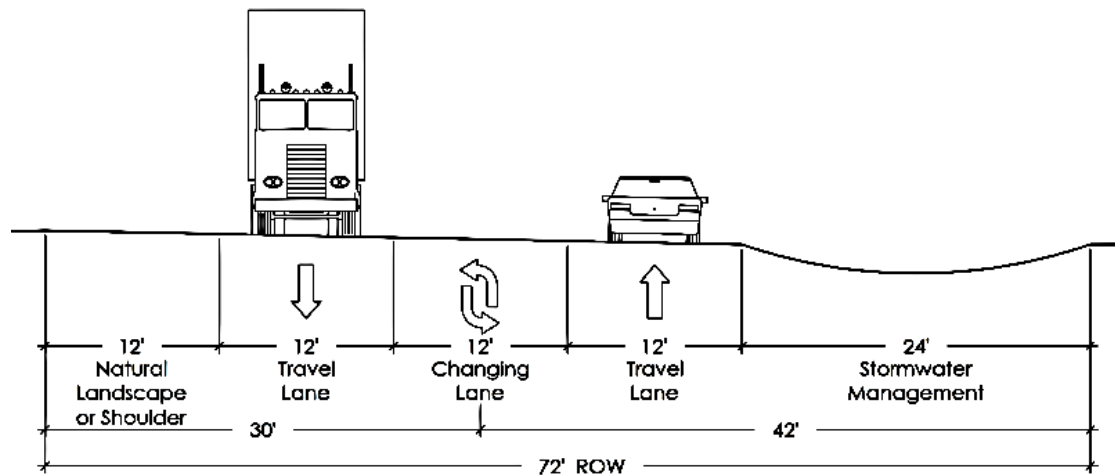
Davis Road (looking north) Cross Section Adjacent to CLIBP
